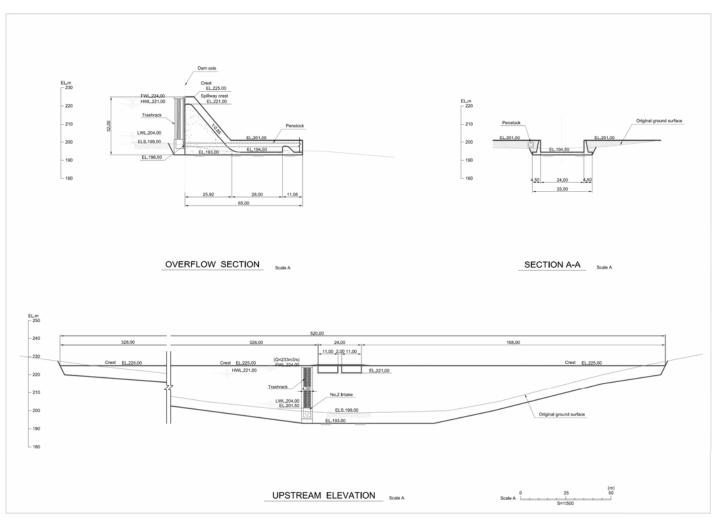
Elevation and Section of No.35-2 Dam
